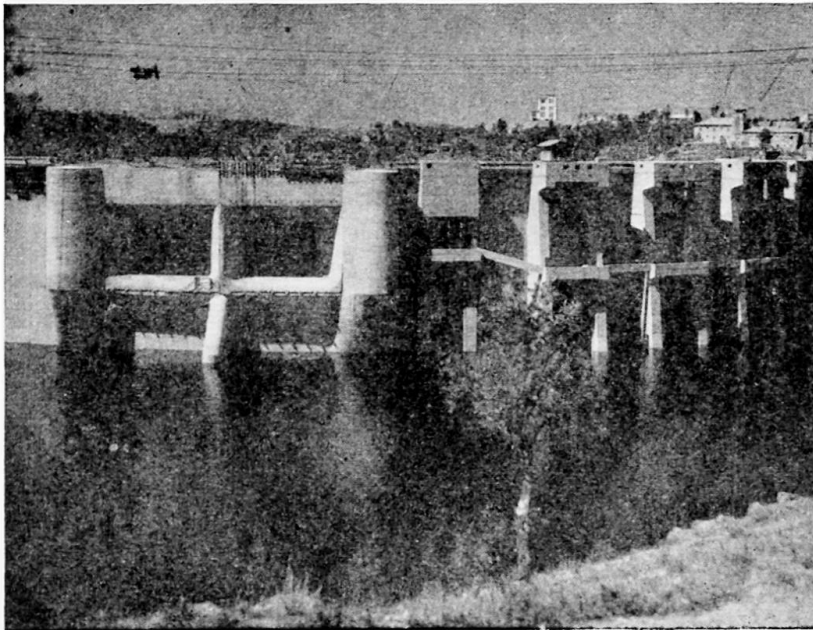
Upstream view of the spillway openings of the Castelo do Bode Dam
